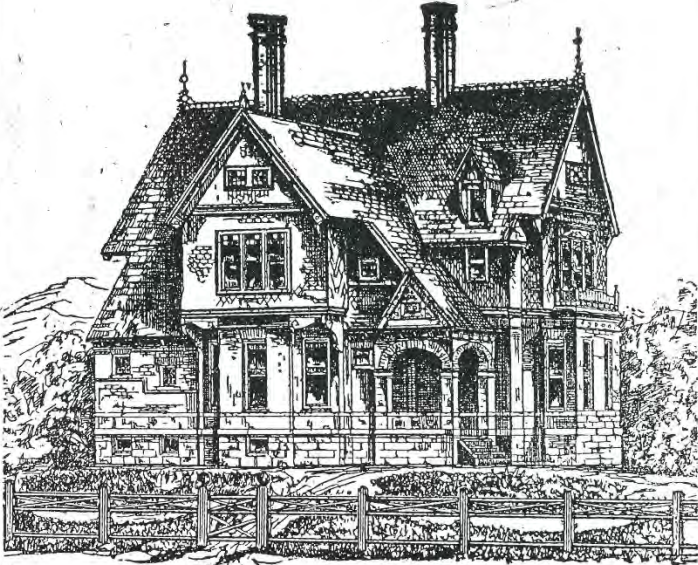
Plate 75, Modern Architectural Designs and Details (1881). "Brick and Frame Cottage," details.
